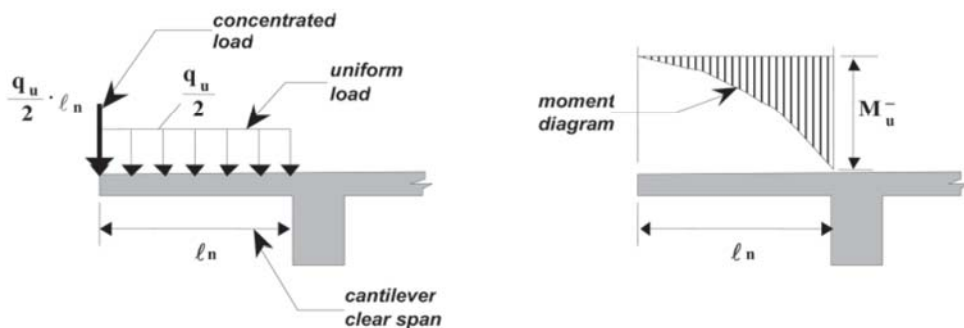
Calculation of negative moment at slab cantilevers.
